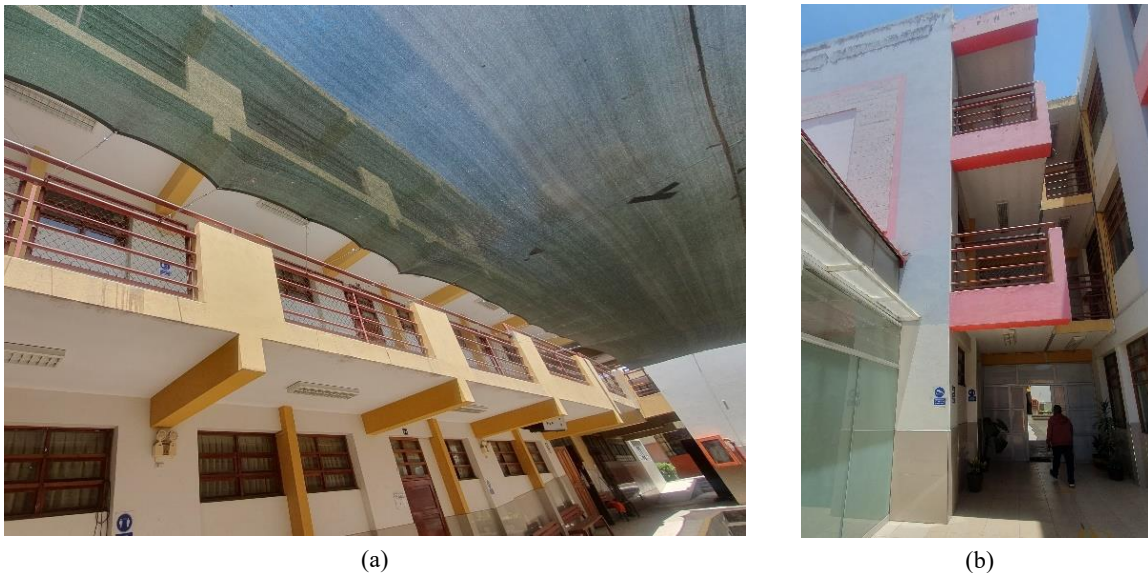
(a) Frontal and (b) lateral elevation views of the school building under study
